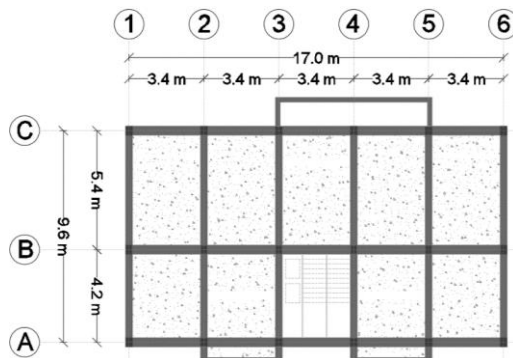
The plan view of the Template Design 1 (TD_1) building
